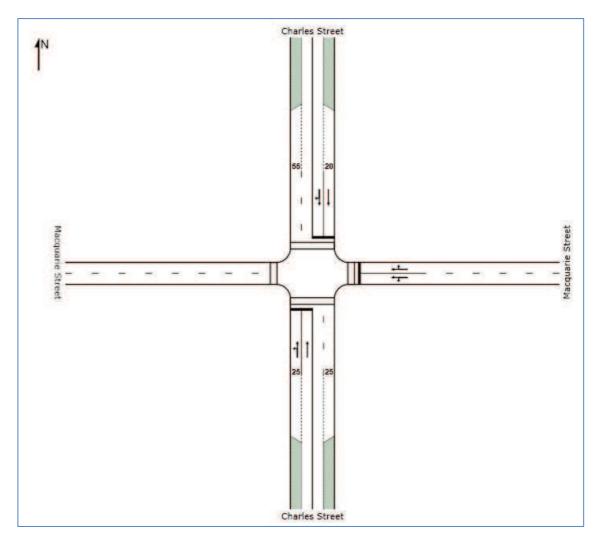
Existing Macquarie Street/Charles Street Intersection Layout
